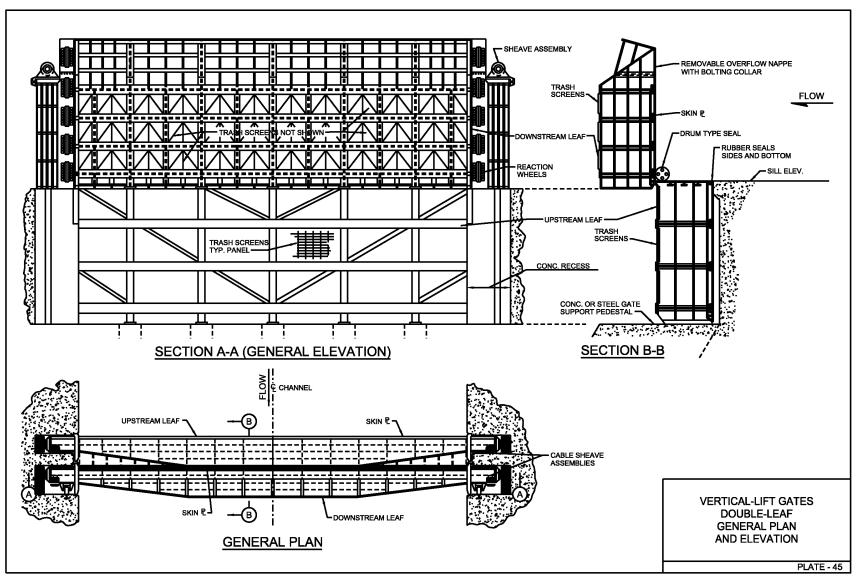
Plate 45: Vertical-lift gates, double-leaf, general plan, and elevation
